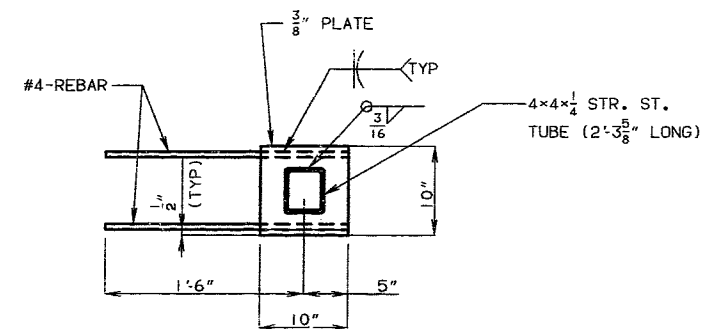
DETAIL OF TRELLIS COLUMN AT & OF PLANTER WALL
